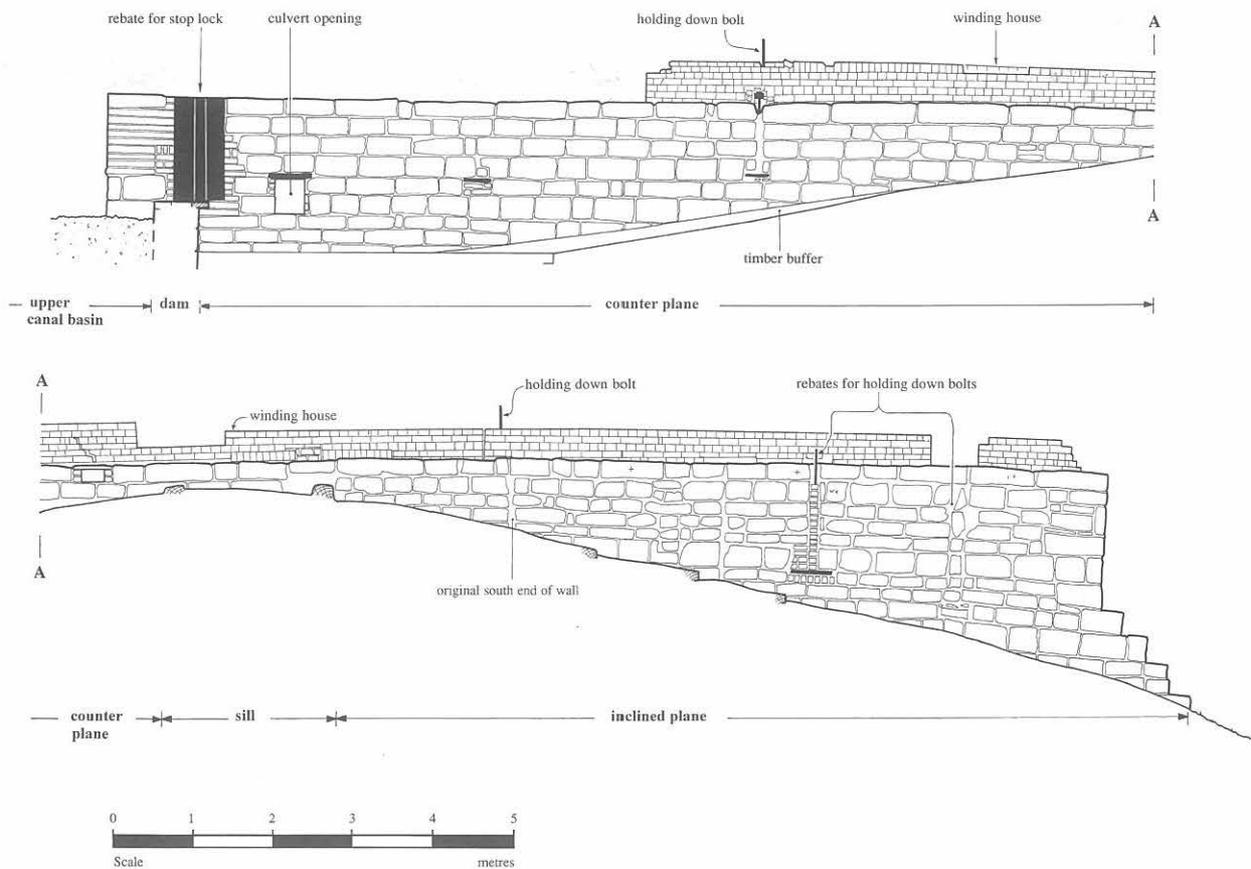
Elevation of the east wall of the eastern loading bay. Before the engine was erected, the wall terminated just south of the sill. The masonry wall is surmounted by the base of a brick winding house, which was also extended southwards when the engine was built. The recessed bolts held down the frame for the winding mechanism.
